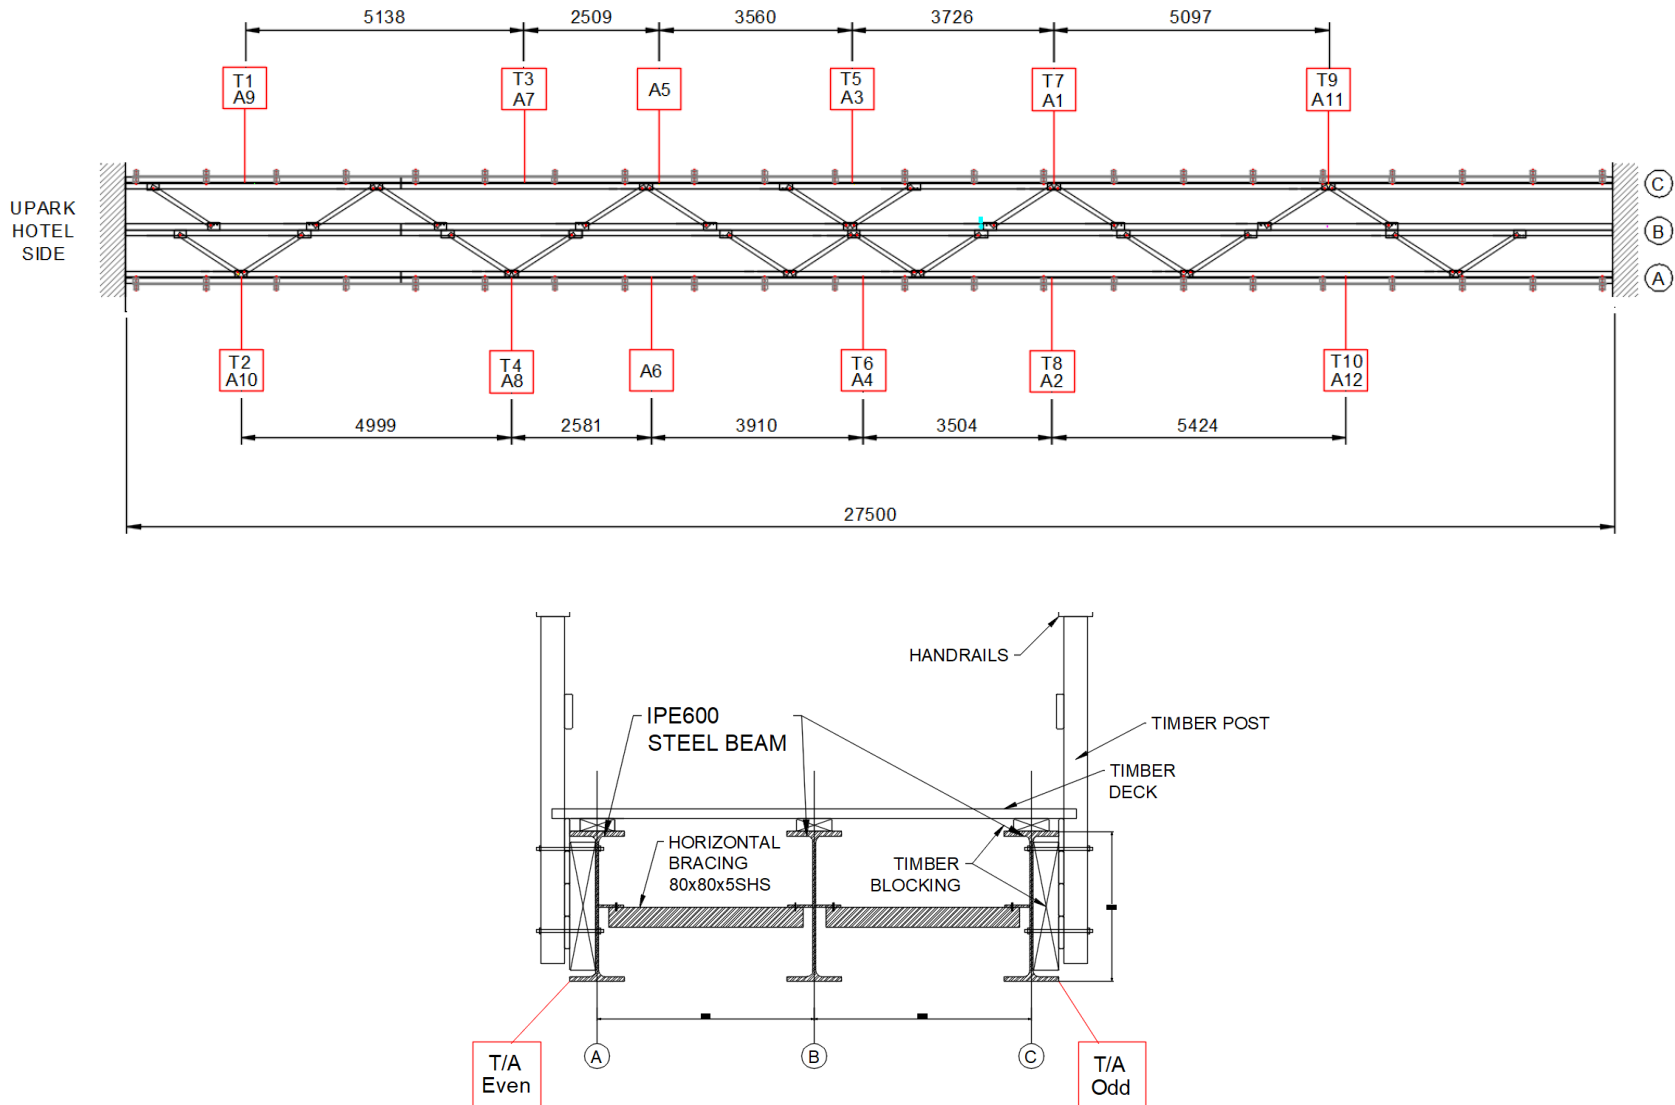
Plan view (upper diagram) and cross-section (lower diagram) of the UT Campus footbridge scale 1:100
